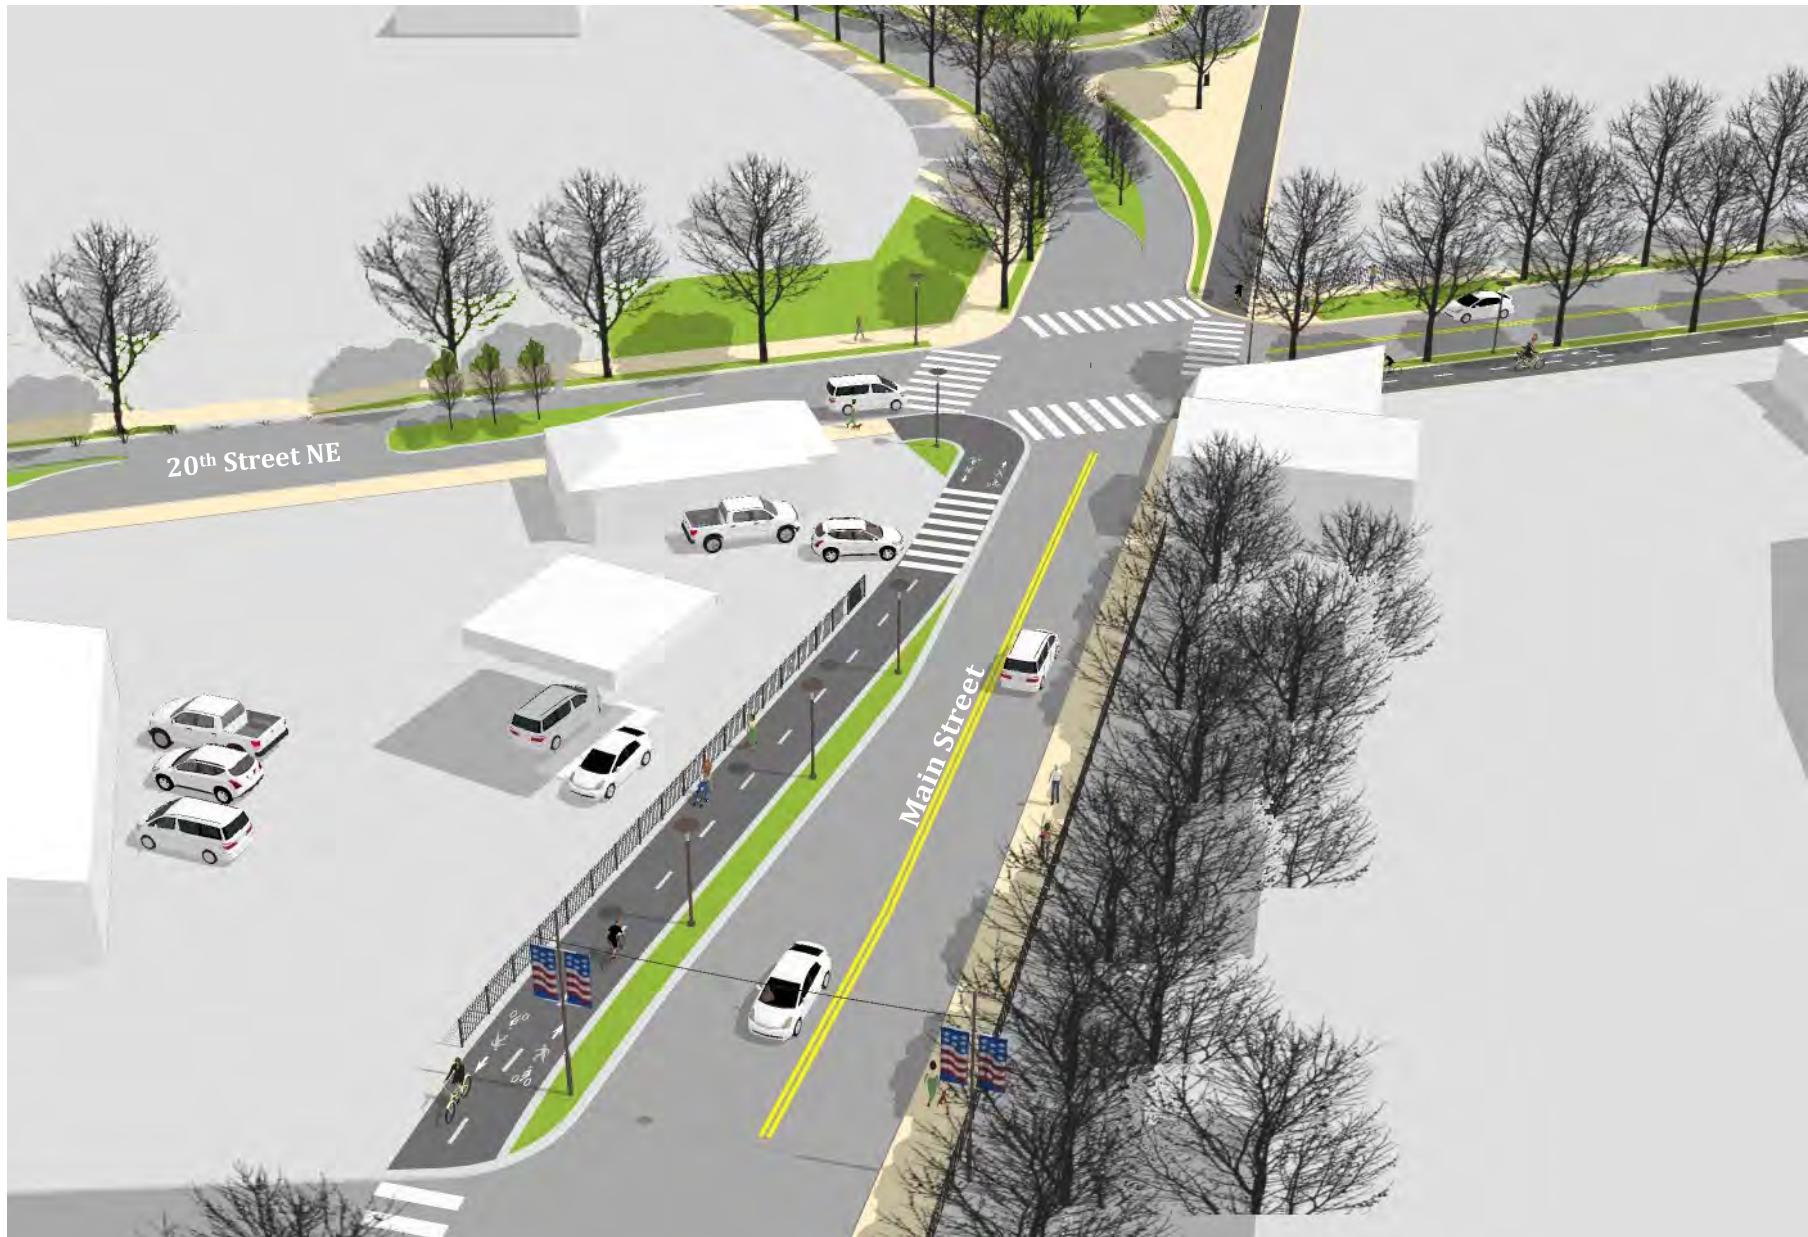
Typical Section Main Street (20th St. NE to Lakeshore Dr. NE)
